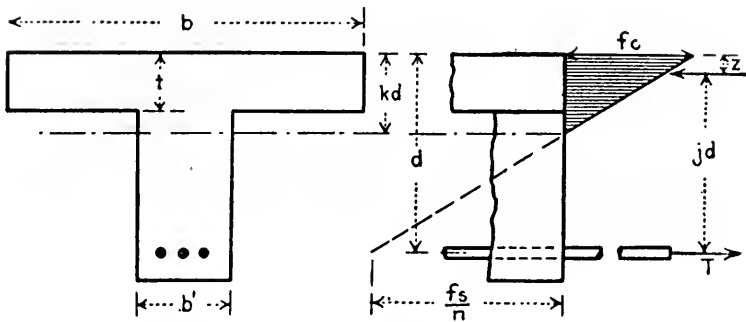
Nomenclature for Reinforced Concrete T-Beam
